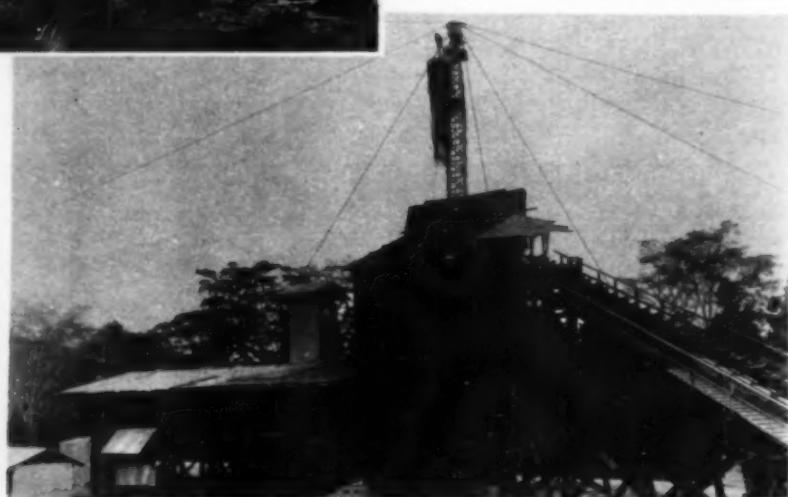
LOADING TERMINAL charges 32-cu.ft. buckets of tramway used in transporting gravel from pit 1 mi. to screening plant at Madden Dam.
